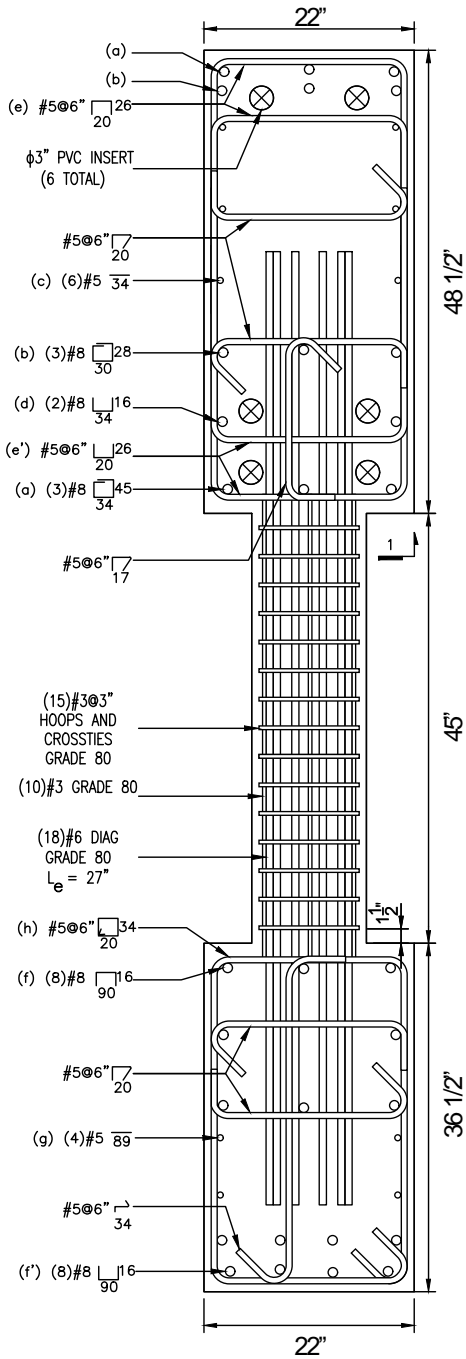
Elevation view of D80-2.5 (1 in. = 25.4 mm)
